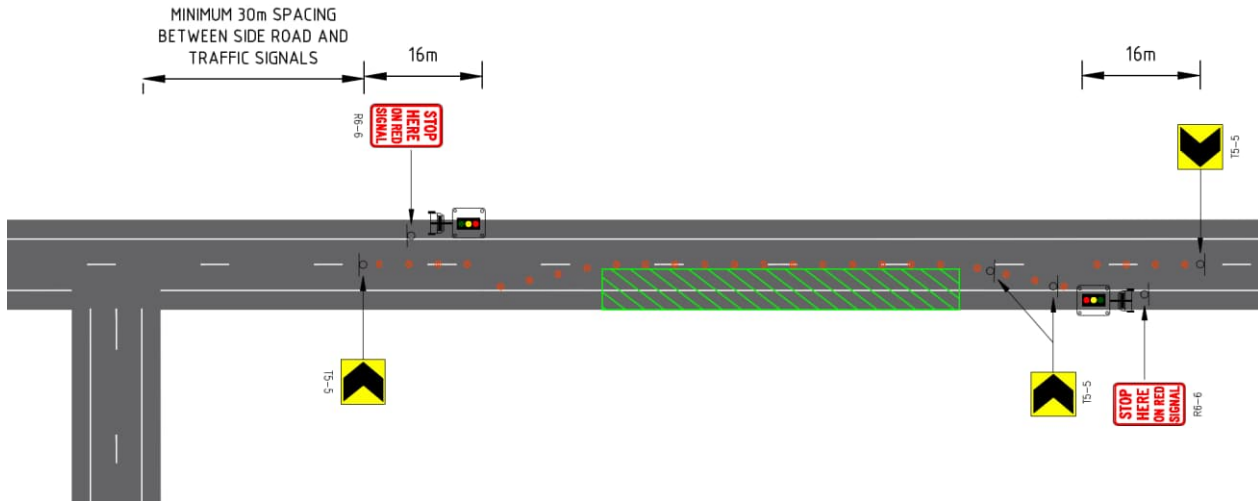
ARRANGEMENT FOR CONSTRUCTION OF INTERSECTION UPGRADES WITHOUT CLOSING LOCAL ROAD
